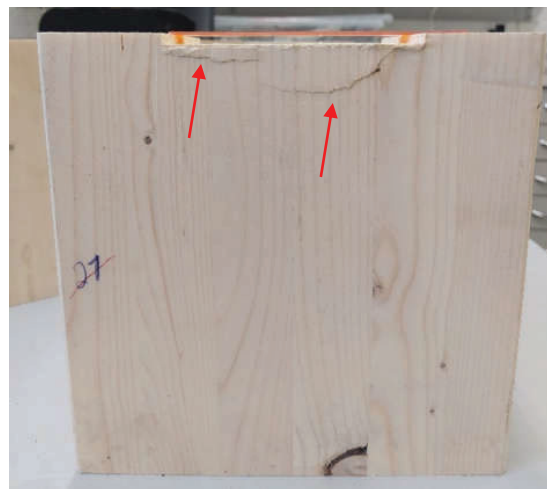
Deformed shape of specimen T15-E4 at maximum force.
